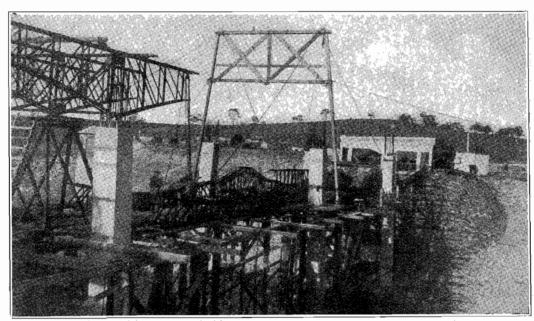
Pyke's Creek bridge, near Ballan, Western Highway, Section 1. Showing welded steel trusses partly erected.
